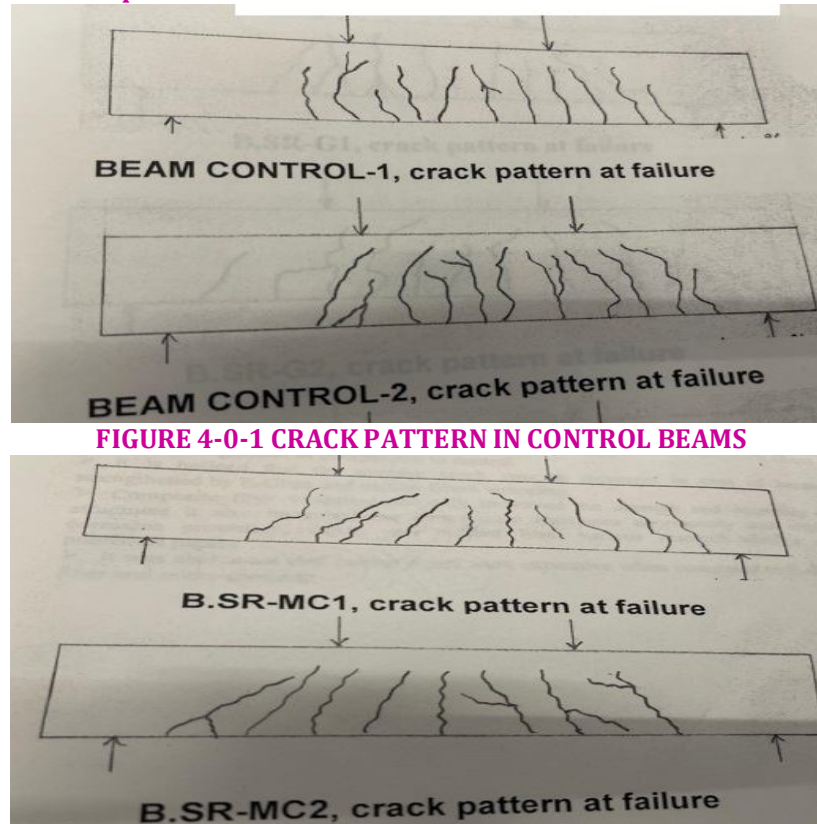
CRACK PATTERN IN MICRO CONCRETE STRENGTHENED BEAMS
